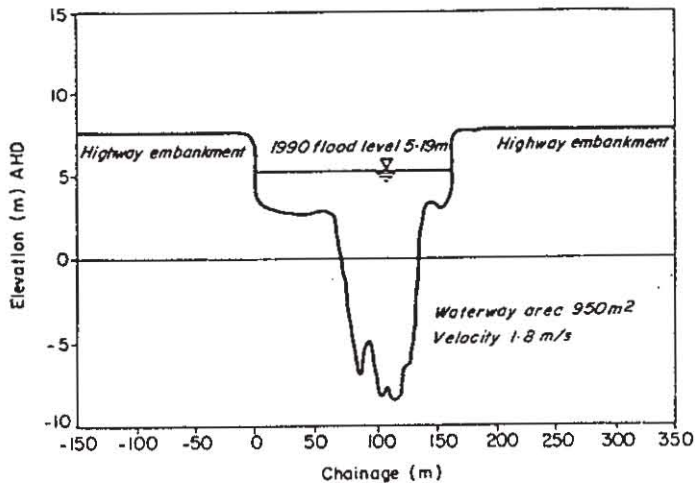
Cross section at bridges. Cross section 1 (looking downstream)
